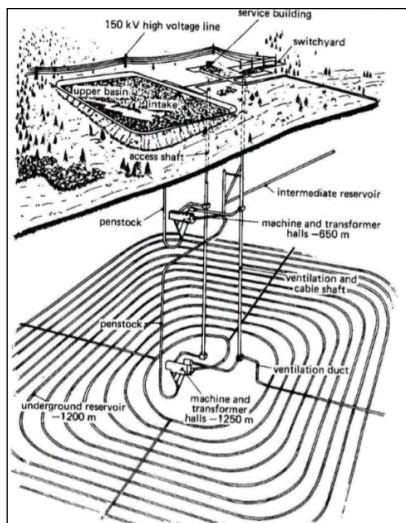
Spiral layout of a lower Underground Pumped Hydro Storage reservoir [9]
